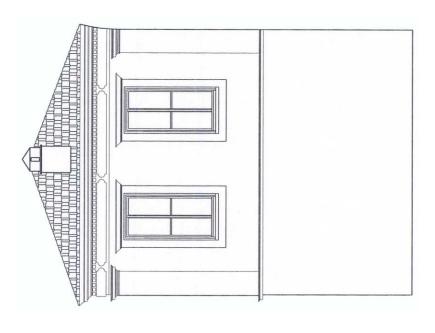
Left Elevation of 19-Hamam Street Scale: 1/75
